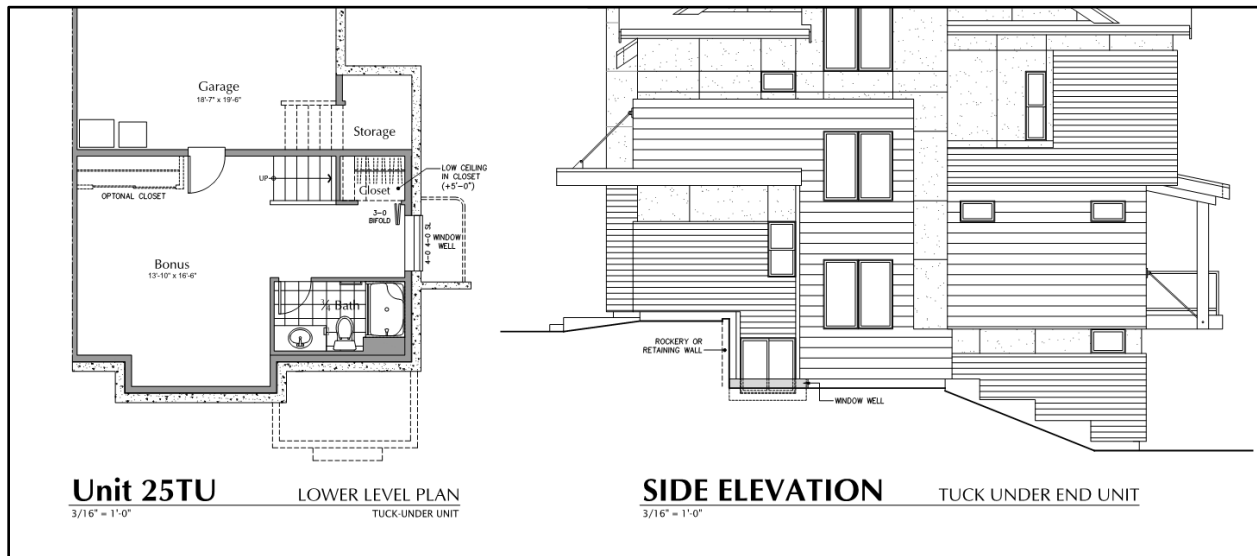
Window wells occur at end units of all buildings along Newport Way
